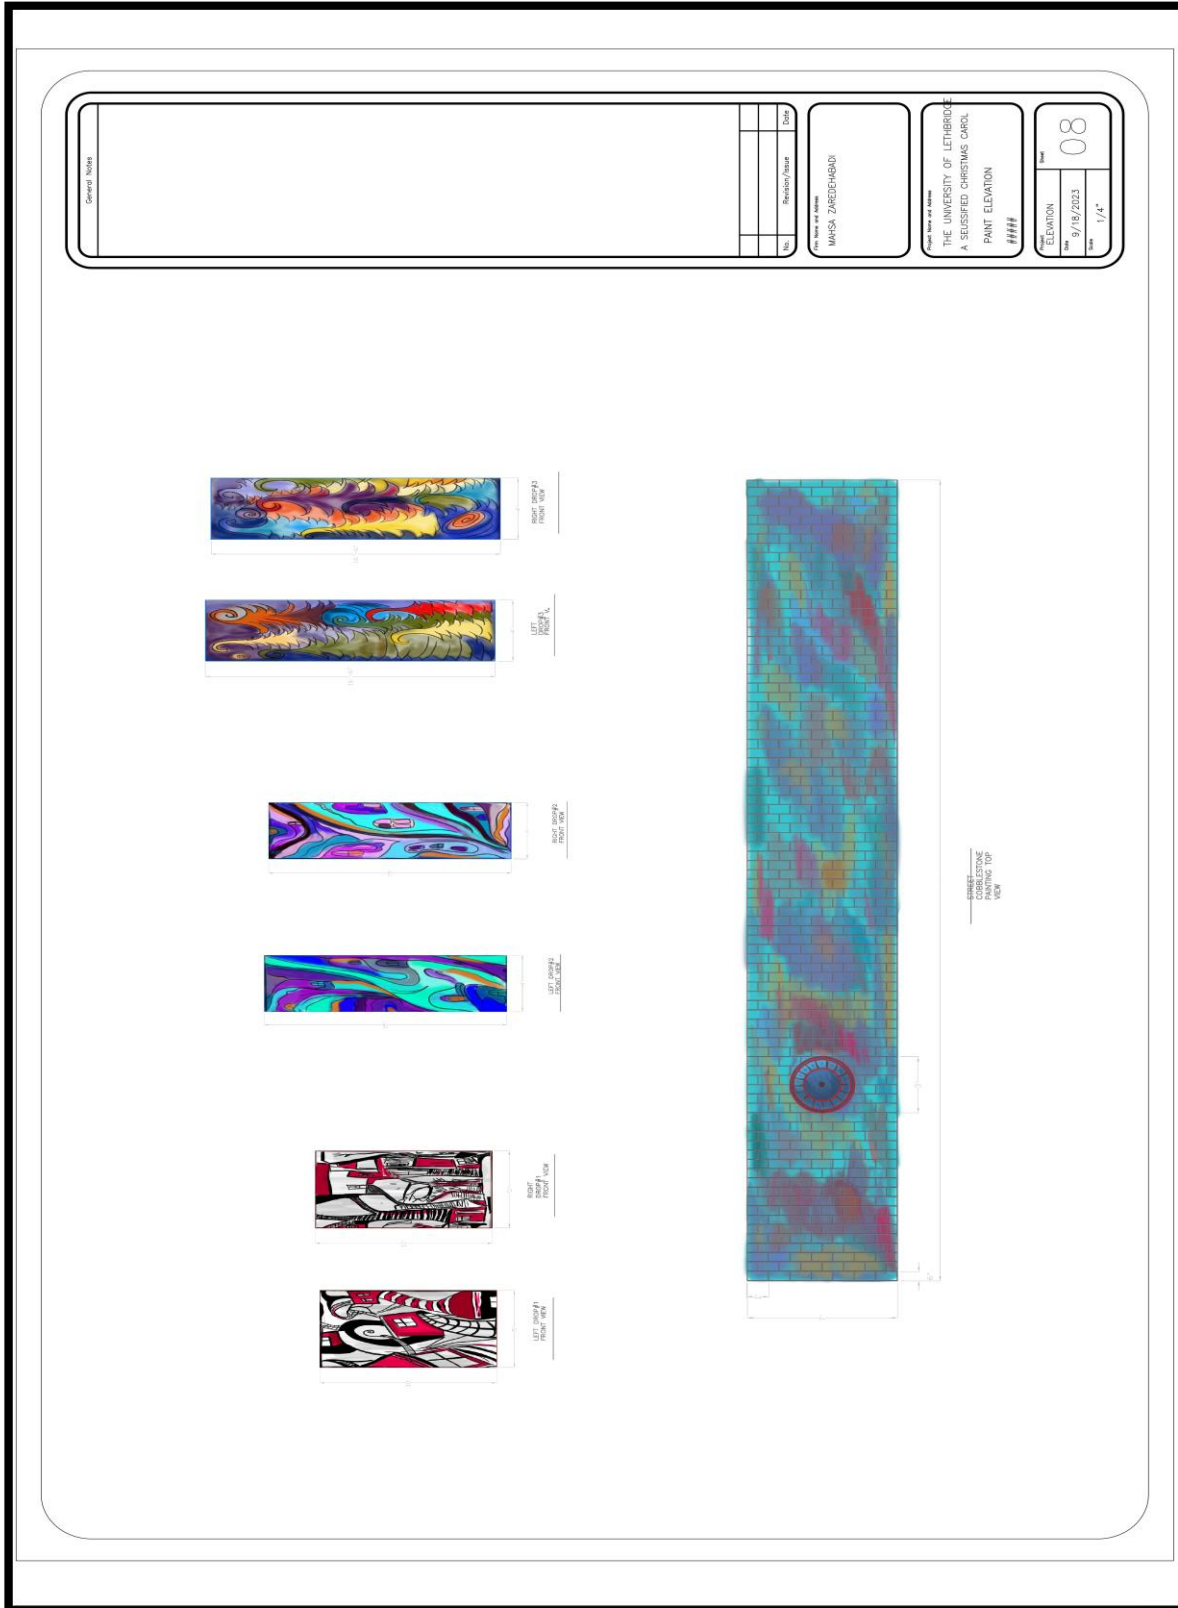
Author's Collection. *Paint Elevation*. 2023.
